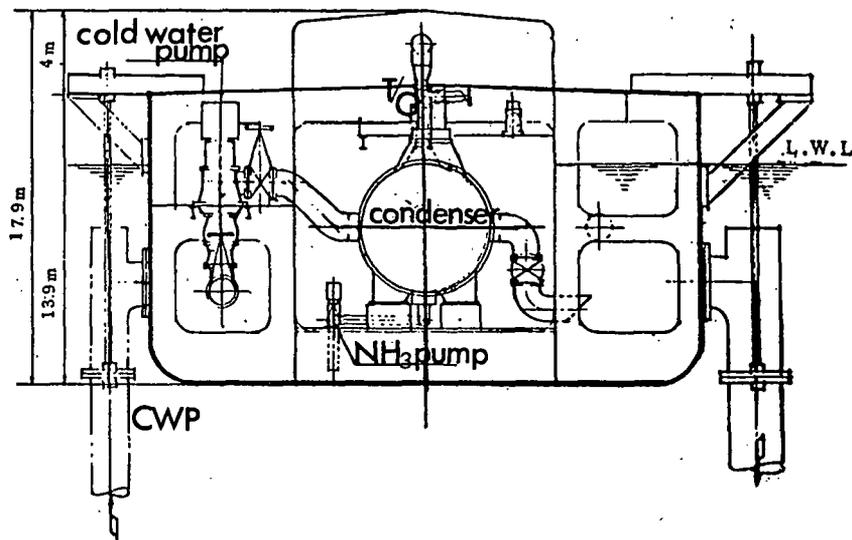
Sectional view of 1-MWe Engineering Test Facility
